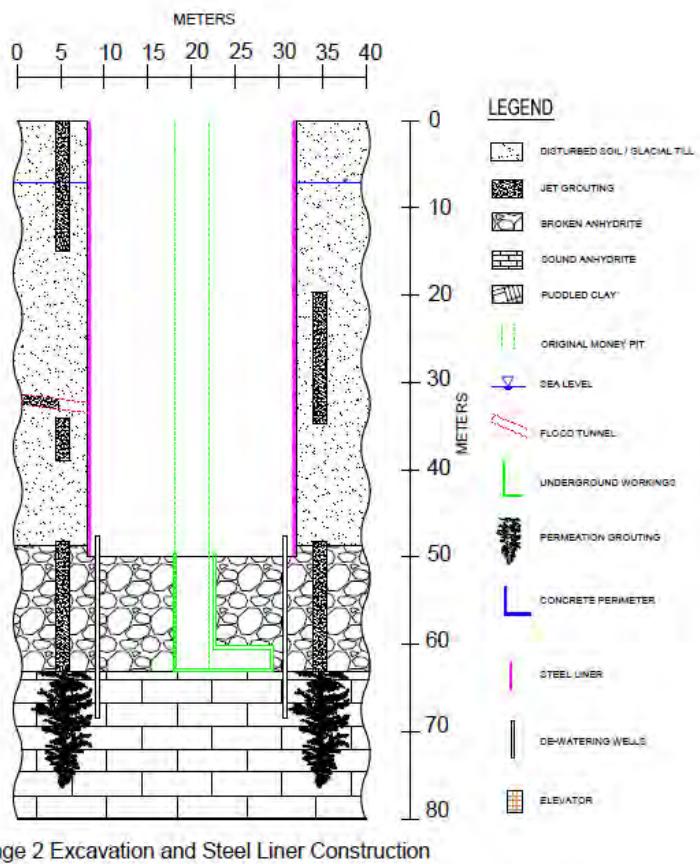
Cross-section of Stage 2 of the deep excavation and steel shaft liner construction
